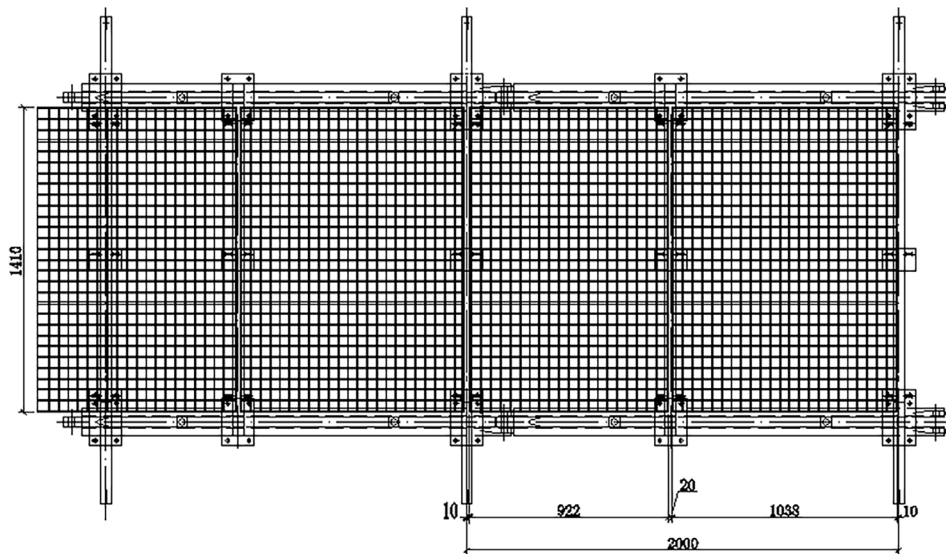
Floor plan drawing of assembled transoms and grille steel plate (1st and 2nd sections) (unit: mm)
